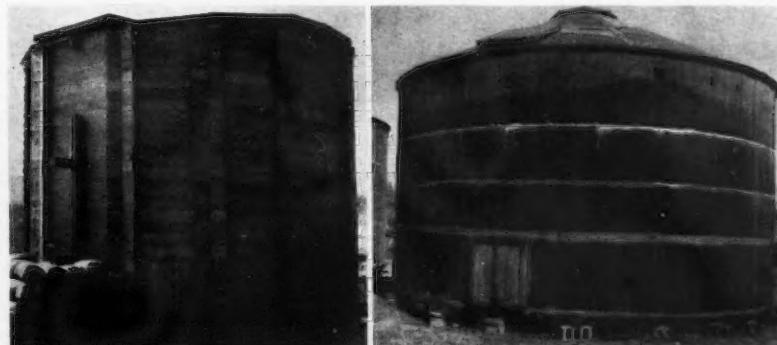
(Left) A 12-sided wood stave bin. The staves which are of 2-in tongue and groove planks are 6 and 8 ft long. Floor is also of 2-in planks, tongue and groove. Roof consists of roll roofing laid over wood sheathing. Diameter, 18 ft; height, 16 1/2 ft; capacity, 3340 bu • Fig. 5 (Right) A circular grain bin with walls and roof made of plywood glued at the joints and covered with roll roofing to give weather protection. Lightweight steel bands have been supplied to this bin for added strength. This precaution has been taken on a number of bins to overcome weaknesses due to defective glued joints. Diameter, 19 ft; height to eave, 10 ft; capacity, 2250 bu
